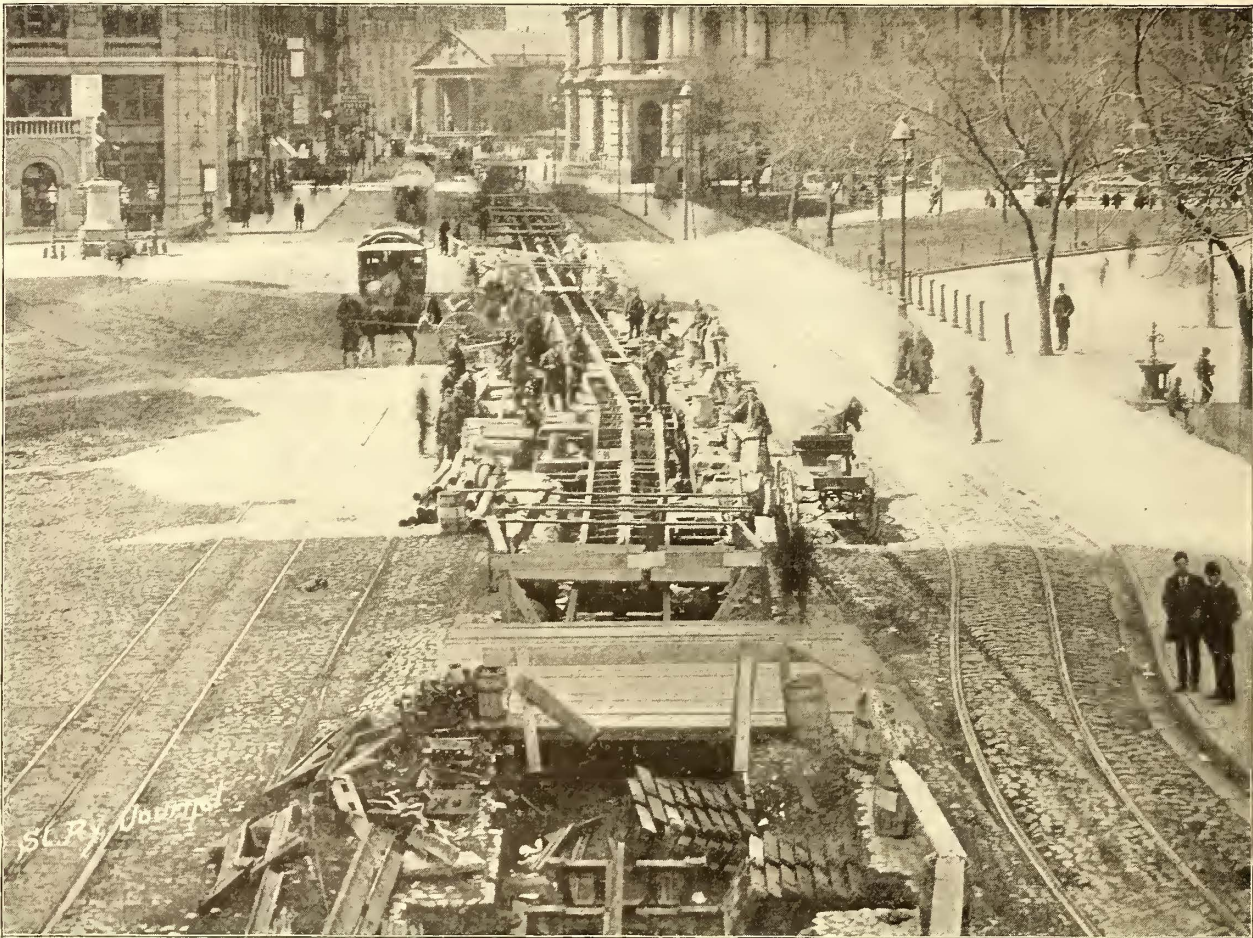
CABLE CONSTRUCTION—THIRD AVENUE RAILROAD, NEAR CITY HALL AND POST OFFICE.
